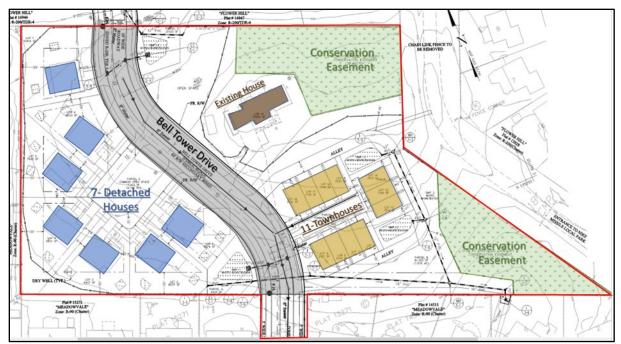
Proposed Meadowvale Site Plan No. 820210100
